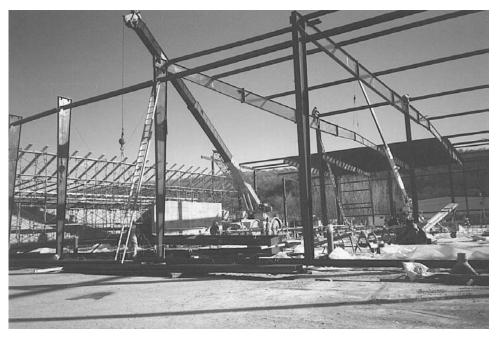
Assembly of multiple-span rigid frames. The columns at left are stabilized by diagonal bracing and wall girts. (*Photo: Maguire Group Inc.*)
